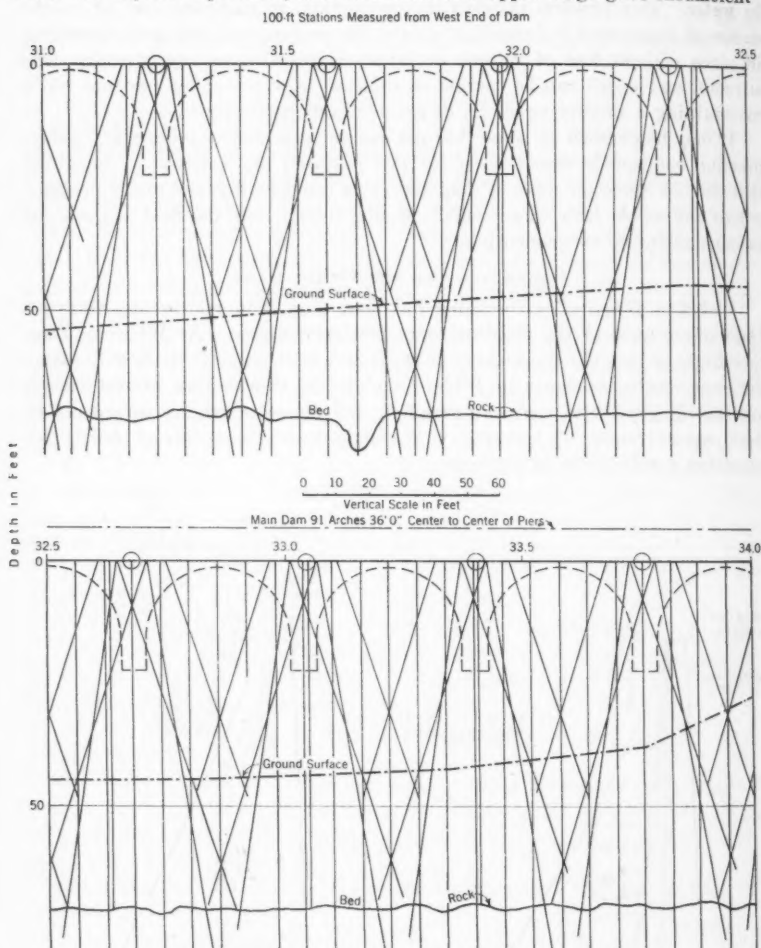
TYPICAL SPACING OF TOP BORINGS, WALWHAN DAM.
